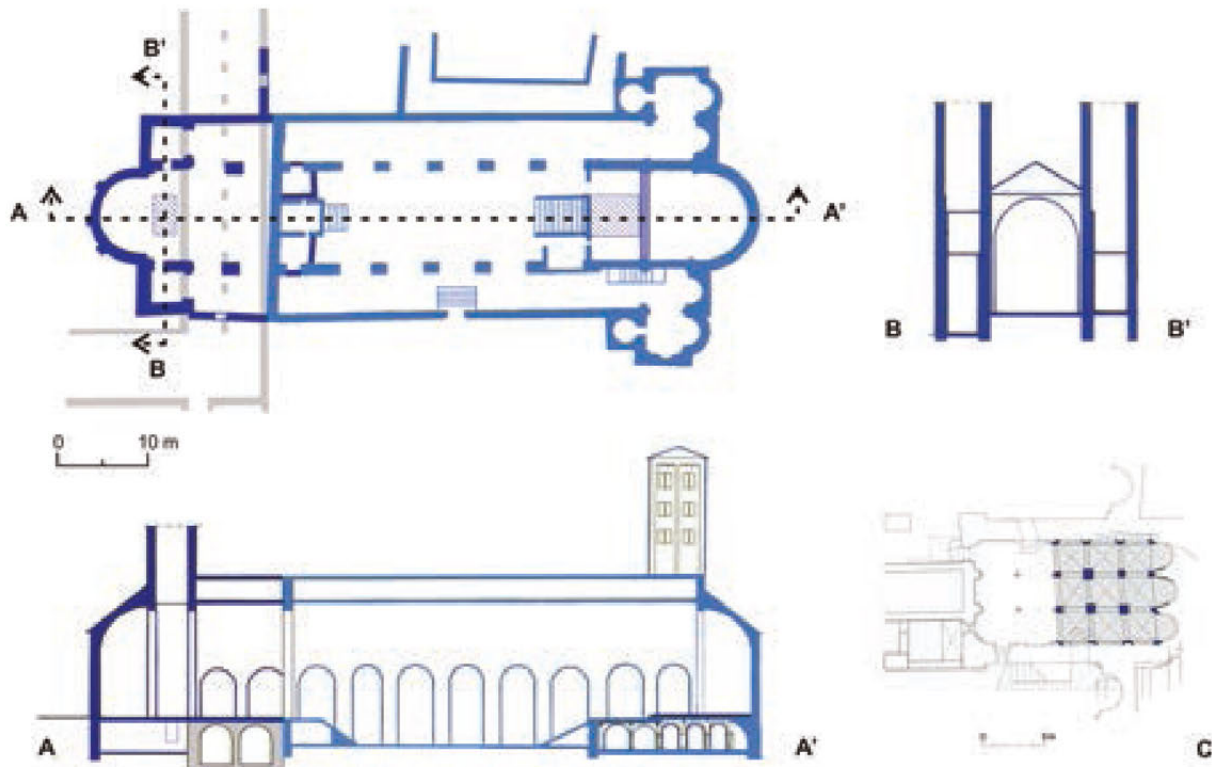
Aosta (I), cathedral in 1064: plan, sections and plan of the crypt (C) (drawings Mauro CORTELAZZO & Renato PERINETTI)
